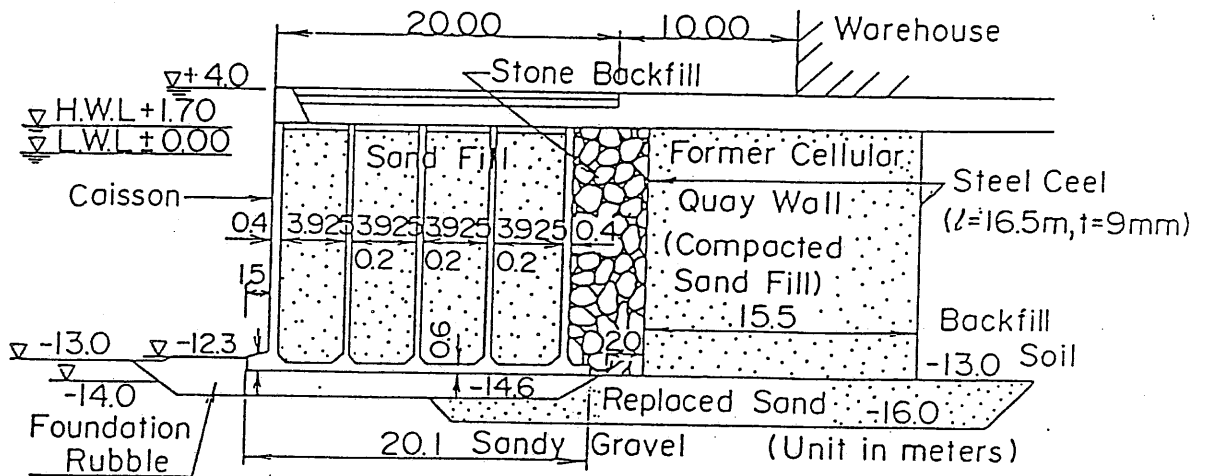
Caisson Quay Wall at Kobe That Performed Well.
